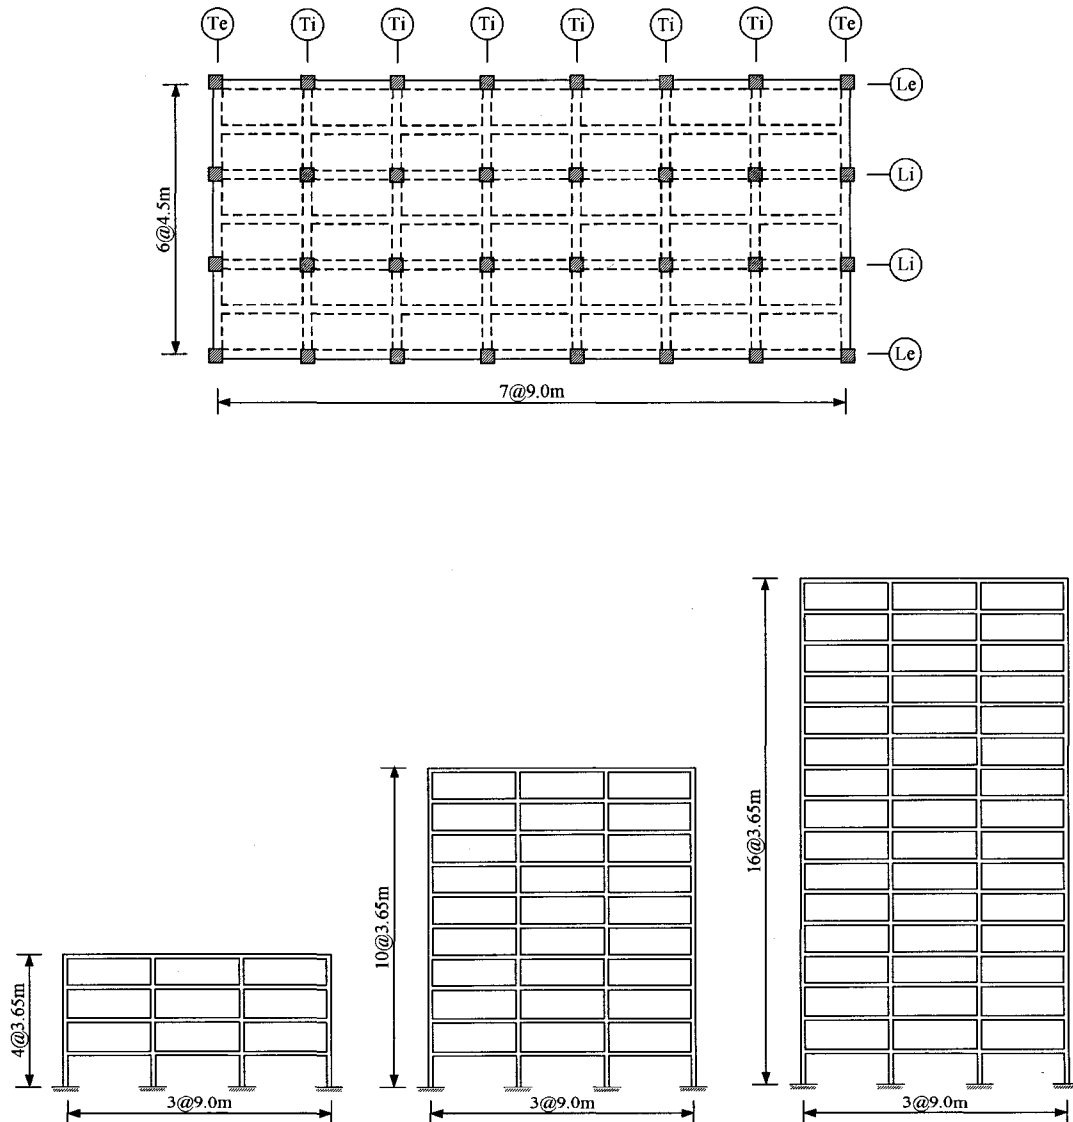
Plan of floors and elevations of transverse frames of the buildings.
